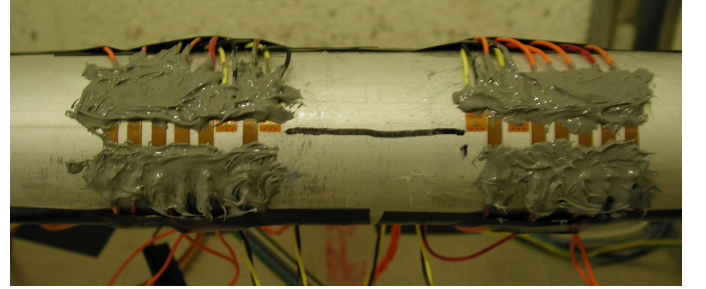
Photograph of crack detection gages and strain gages. The surface notch was marked in black with a pen.
